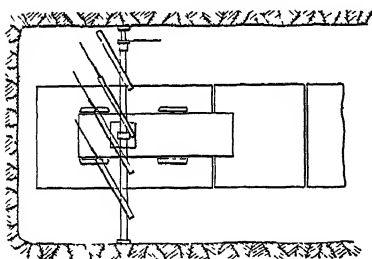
DRILL-SHAFT IN POSITION TO BE JACKED.
